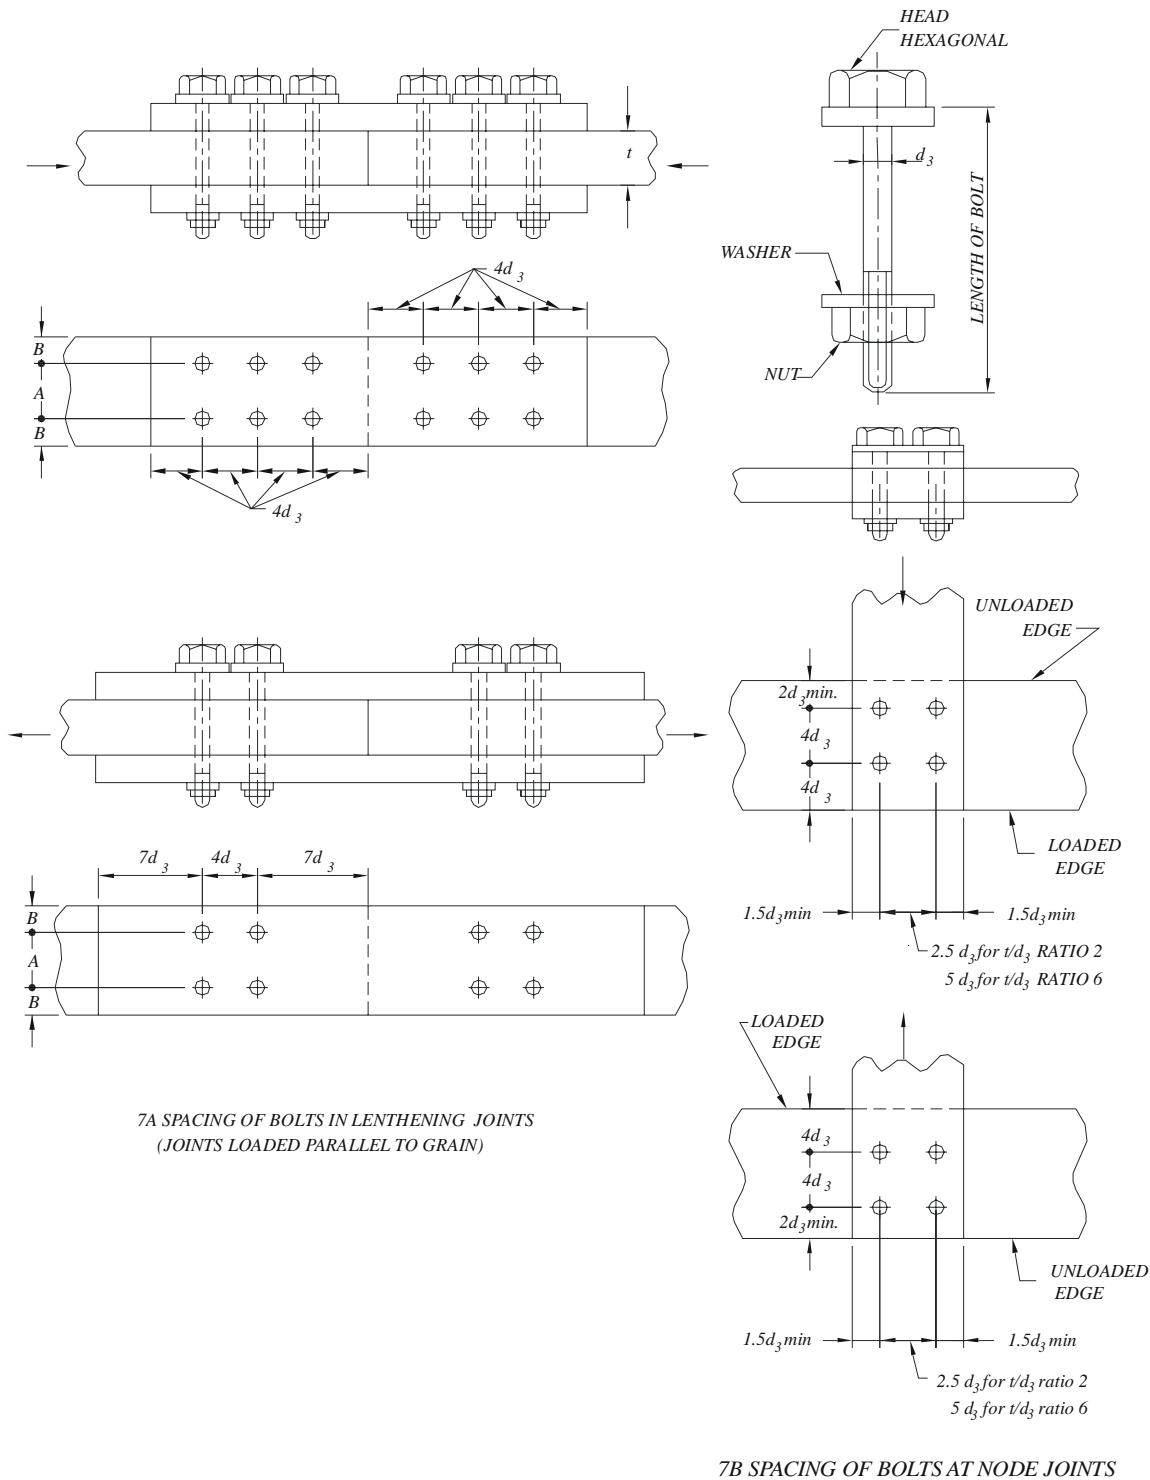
Typical Spacing Of Bolts In Structural Joints
